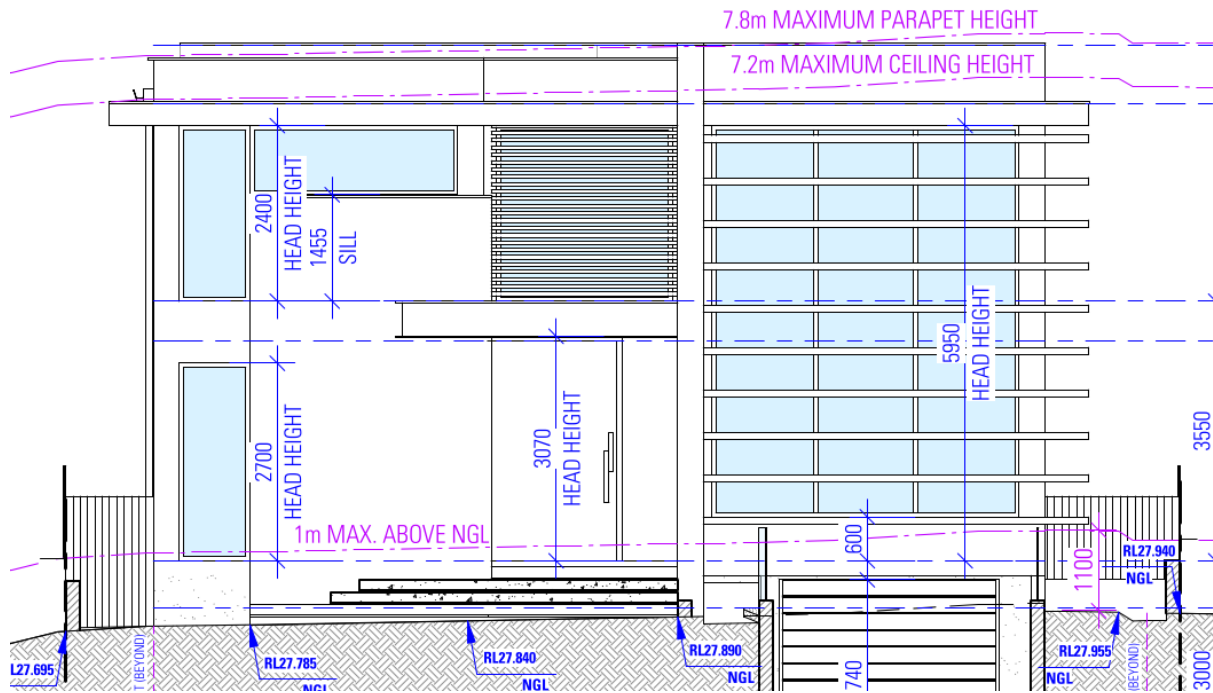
Extract of the western elevation of the proposed dwelling, fronting Howard Street.
